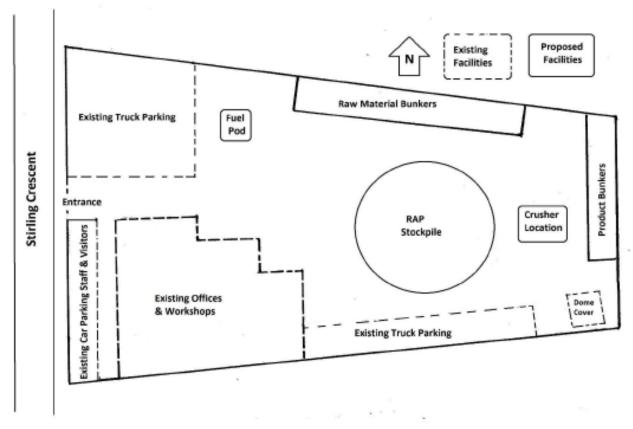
Site Plan143A Stirling Crescent, Hazelmere.
